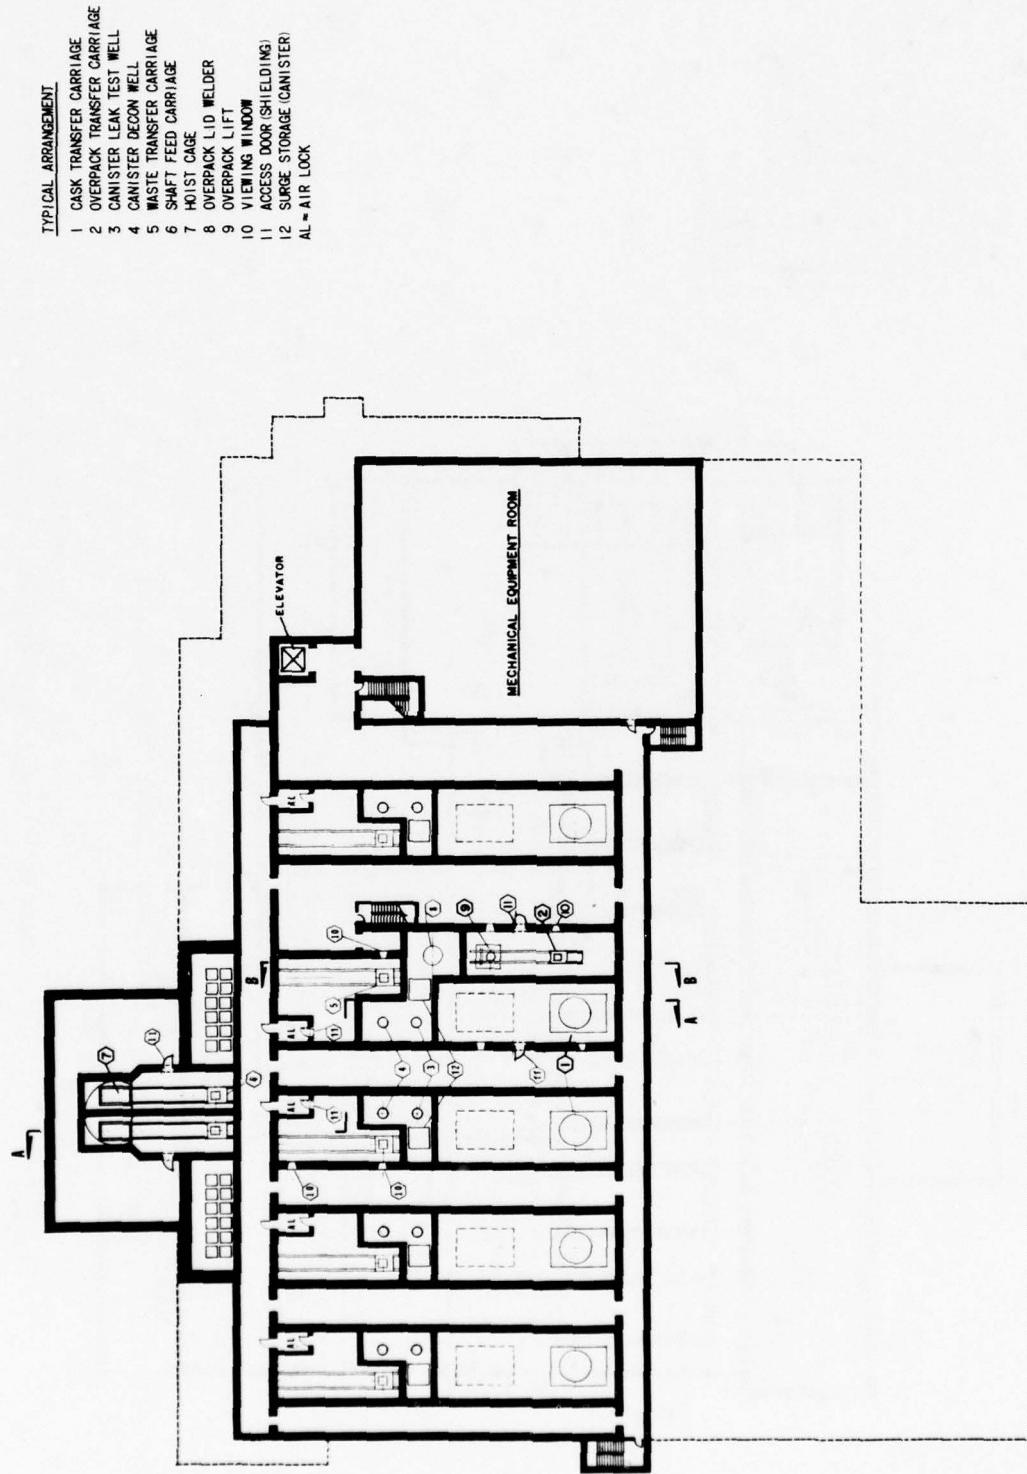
Canistered Waste Building Basement Plan, Once-Through Fuel Cycle, Repository in Salt
